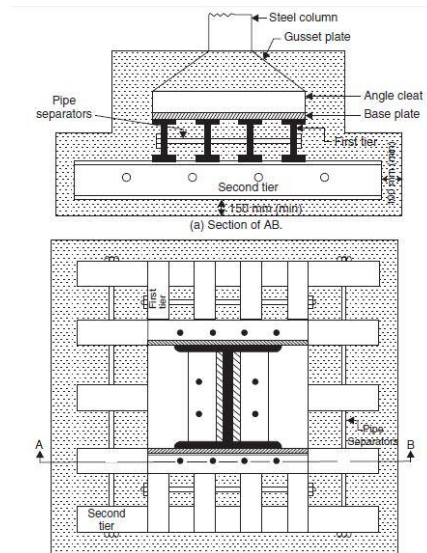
Typical foundation grillage in early 20th century building [4]
